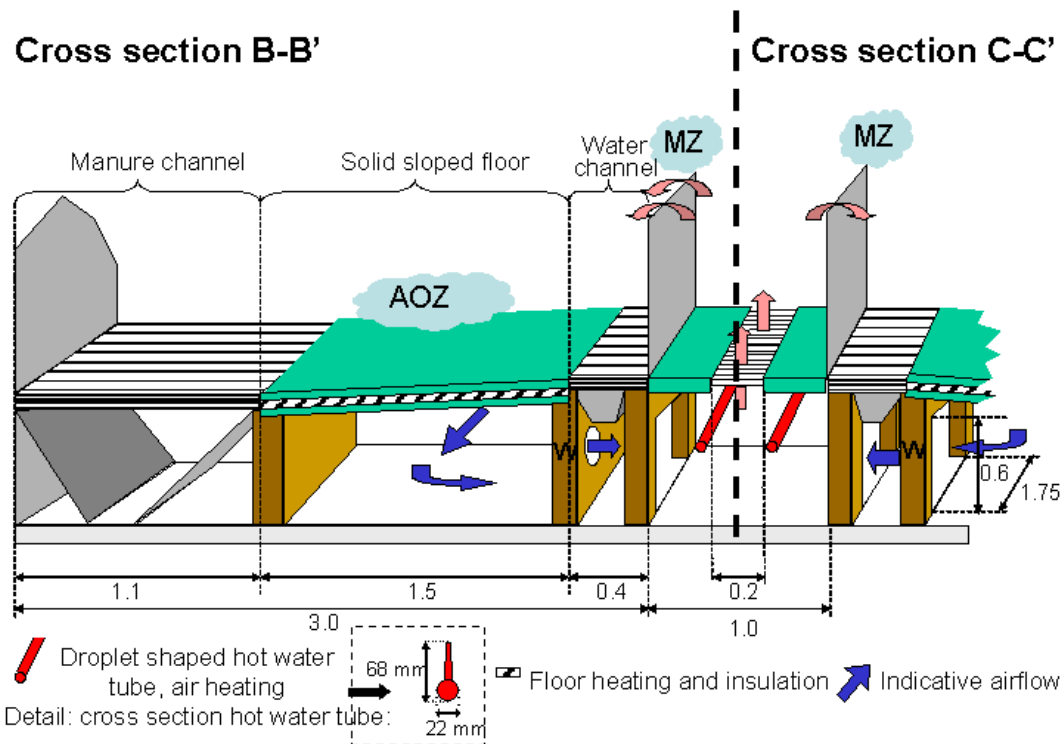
Cross-sections B–B' and C–C' of the ground channel (fig. 1) showing the animal-occupied zone (AOZ) and mixing zone (MZ) where sensors were located. The detail cross-section shows a heating tube. All dimensions in m (not to scale).
